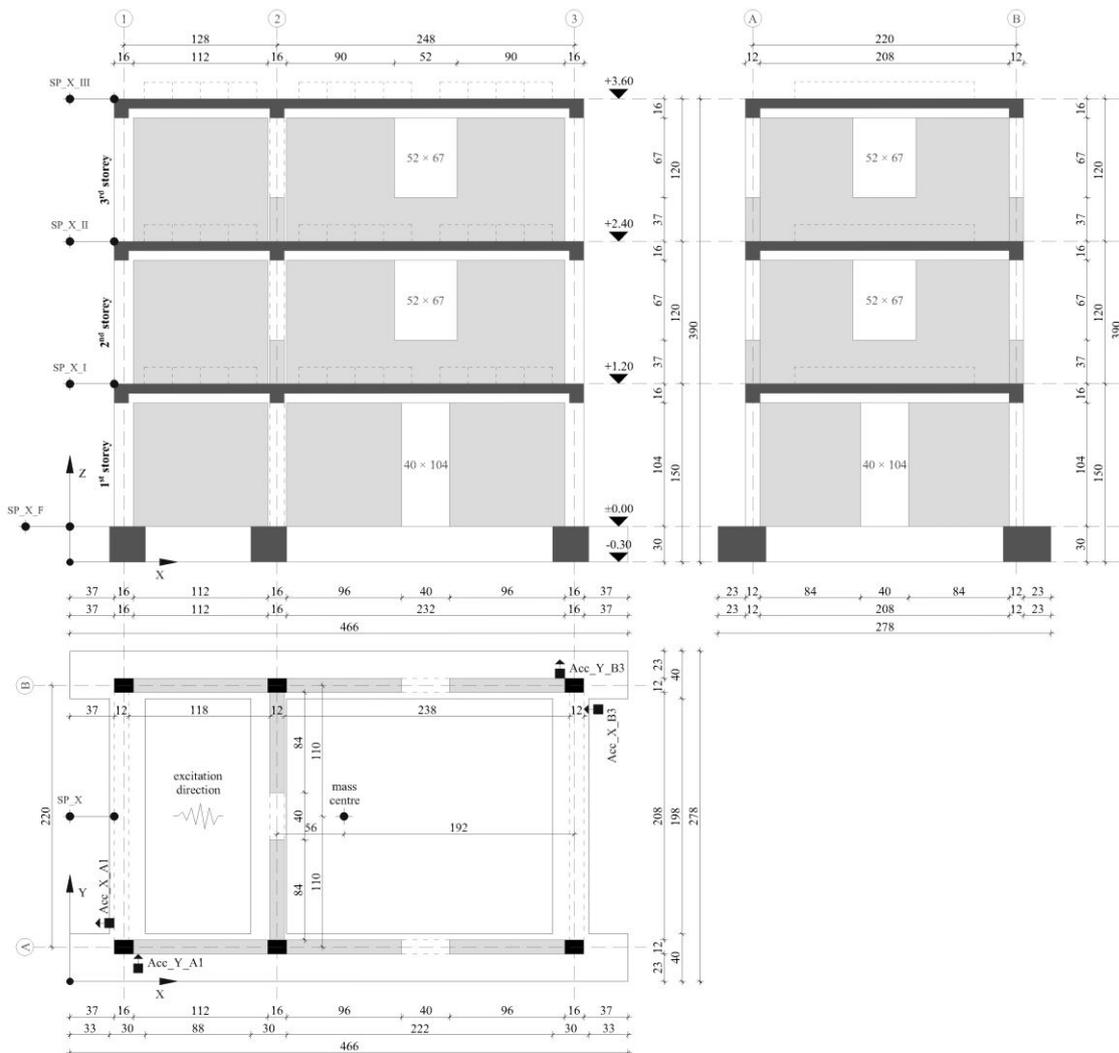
Longitudinal (top left), transverse (top right) and instrument plan views of the Series 1 structure (all dimensions in cm)
